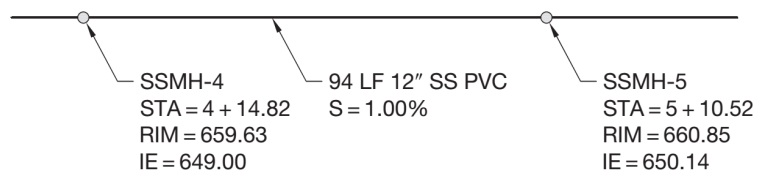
Begin the plan and profile drawing with the plan layout of a small section of sanitary sewer line and two manholes.
